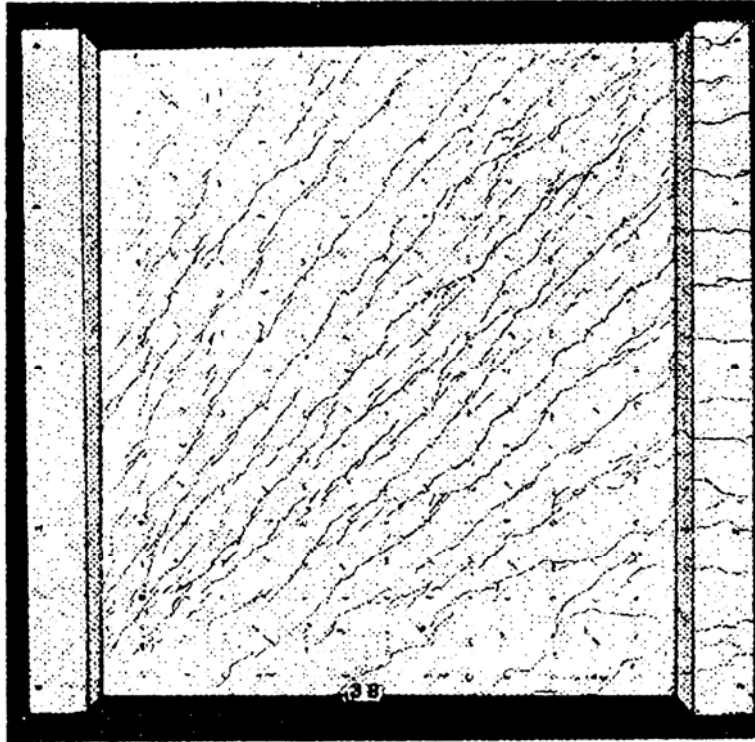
Cracking pattern for wall S3 tested by Maier and Thürlimann (1985) at first yielding of horizontal web reinforcement
